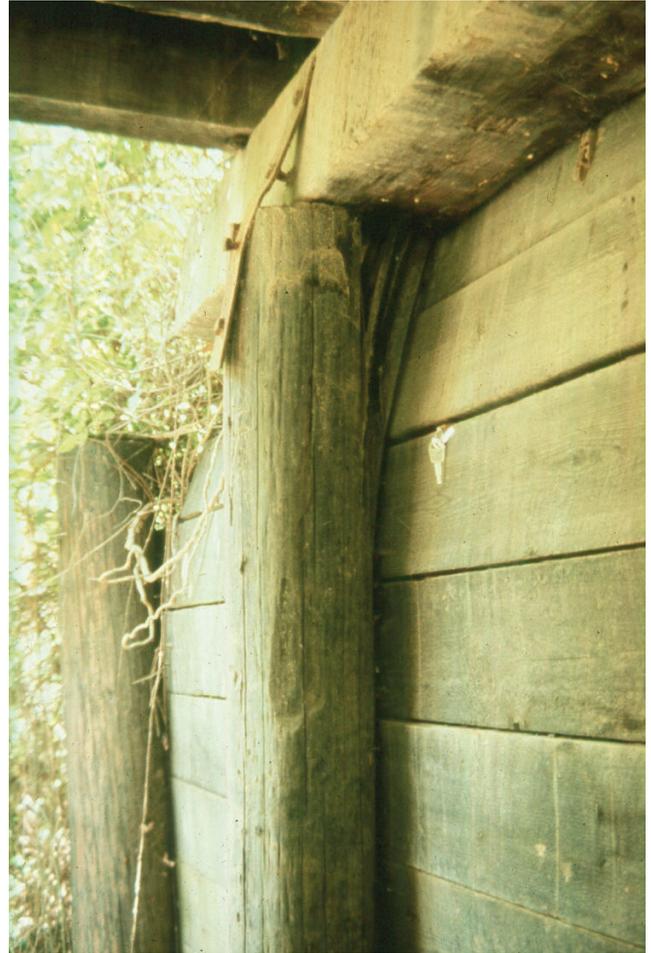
Local Failure in Timber Pile due to Lateral Movement of Abutment
